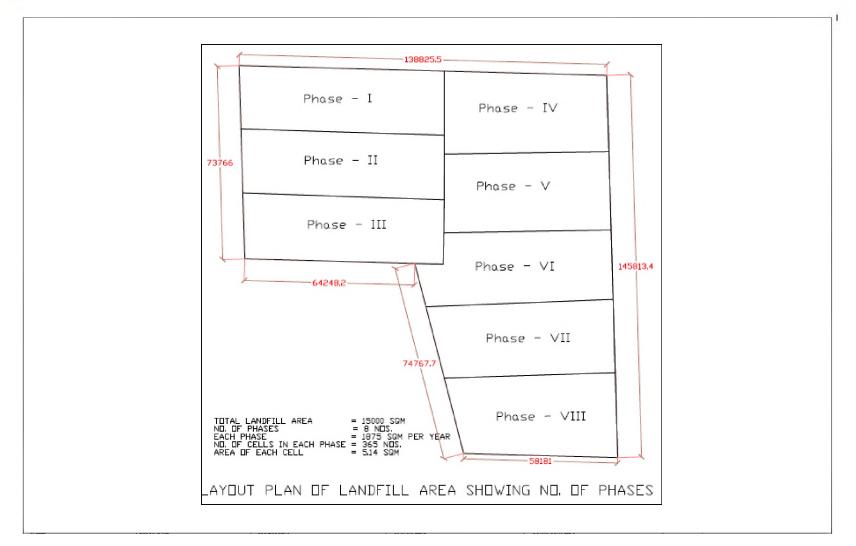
LAYOUT PLAN OF LANDFILL AREA SHOWING NO. OF PHASES
